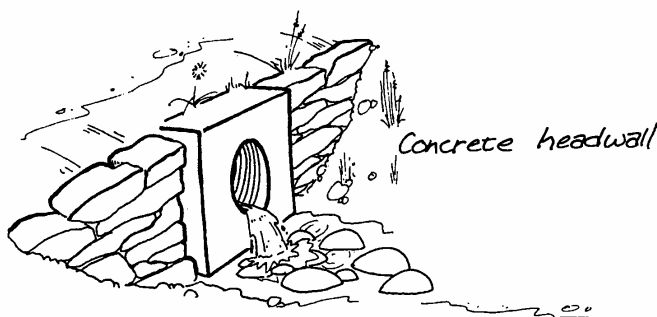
Culvert outlet protected with a concrete header. Source: Lambert (1997).
